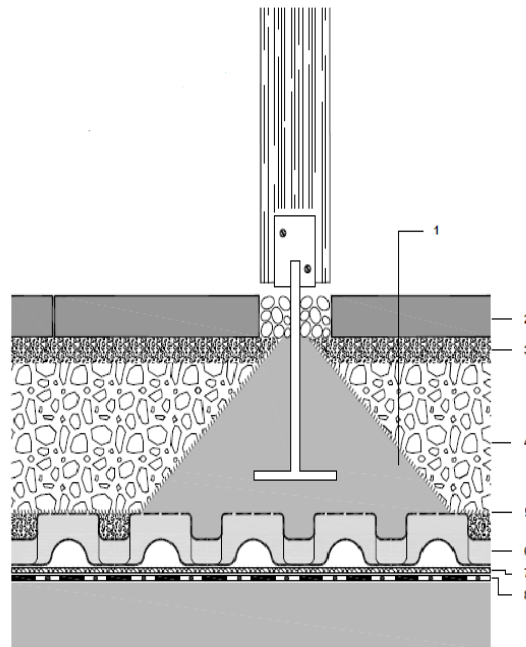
, 1.Concrete foundation for supporting structures.2 .Concrete paving slab.3 .Stone chippings, height (30 - 50 mm).4. Gravel base layer.5. Filter Sheet .6. Drainage Element 7.Protection Material .8. Roof construction with root-resistant waterproofing.
